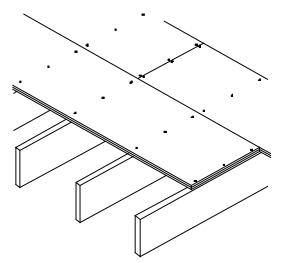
Tongued and grooved edge structural decking should be laid across the joists with short edges supported on joists
